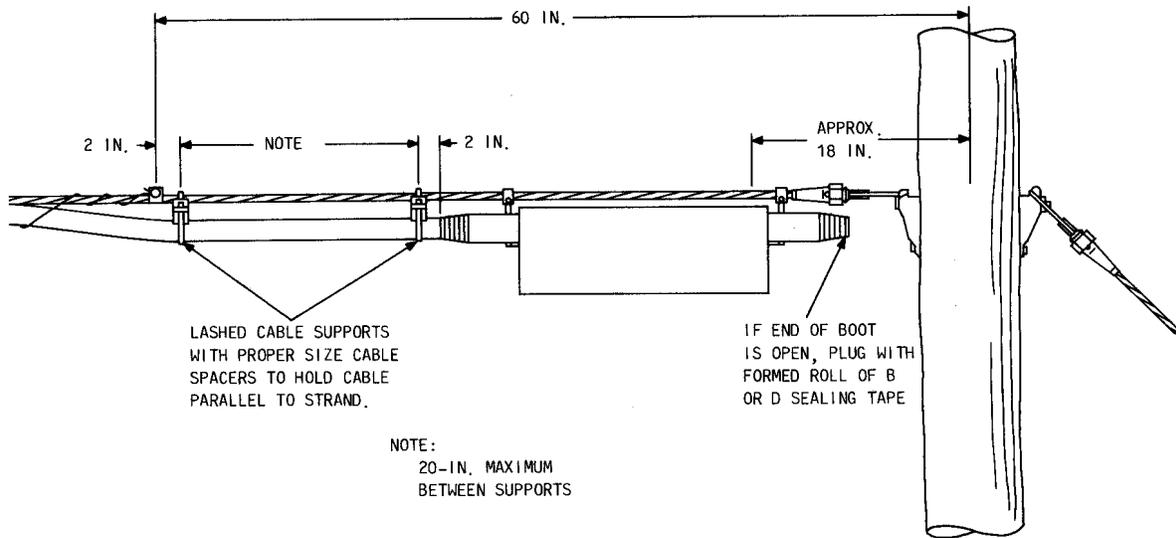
105-Type Cable Terminal—Dead-End Pole
